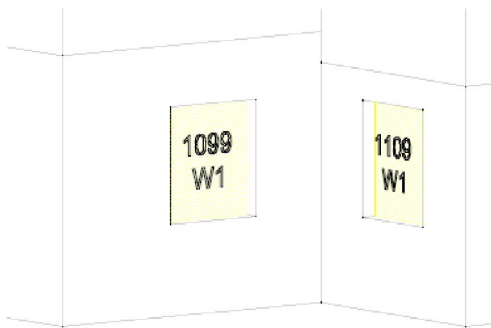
3D computer model of 19 Oval Road lower ground floor windows
